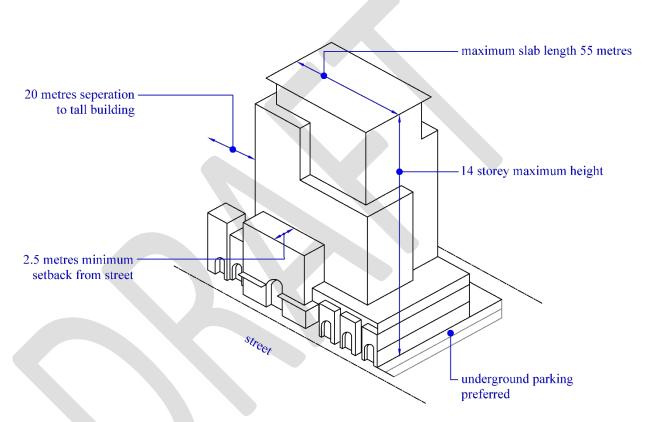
A.F5: Illustration of Above Street Wall and Podium Development Standards
